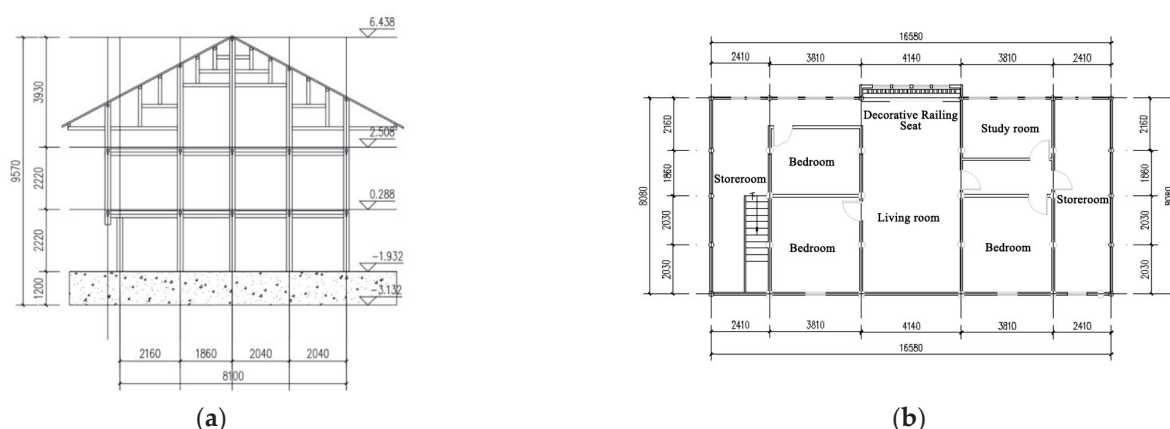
Traditional timber houses in Wu-Dong Miao Ethnic Village. (a) Sectional view showing floor heights (2000–2400 mm) designed as multiples of 8. (b) Second-floor plan with dimensions (e.g., 1860 mm, 2040 mm) reflecting cultural numerology and “Ya Bai” practices.
